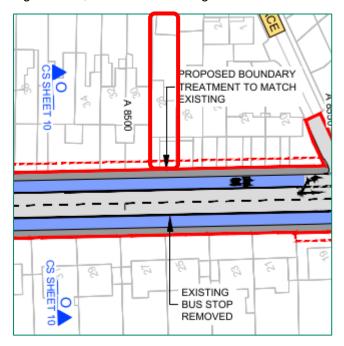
Proposed new Layout at 28 Malahide Road
